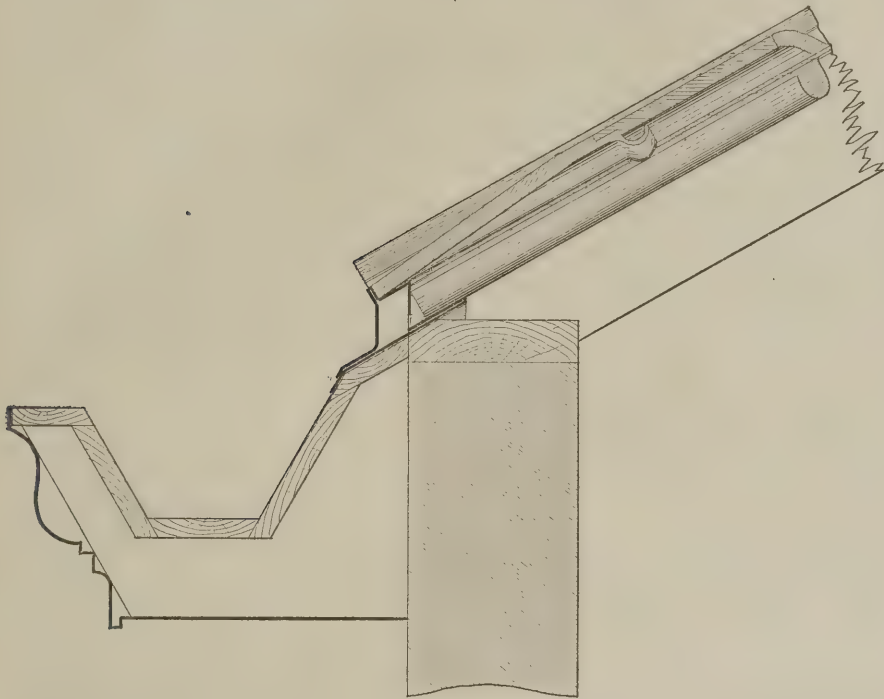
Longitudinal Section through Coopers' Tile Roofing.
